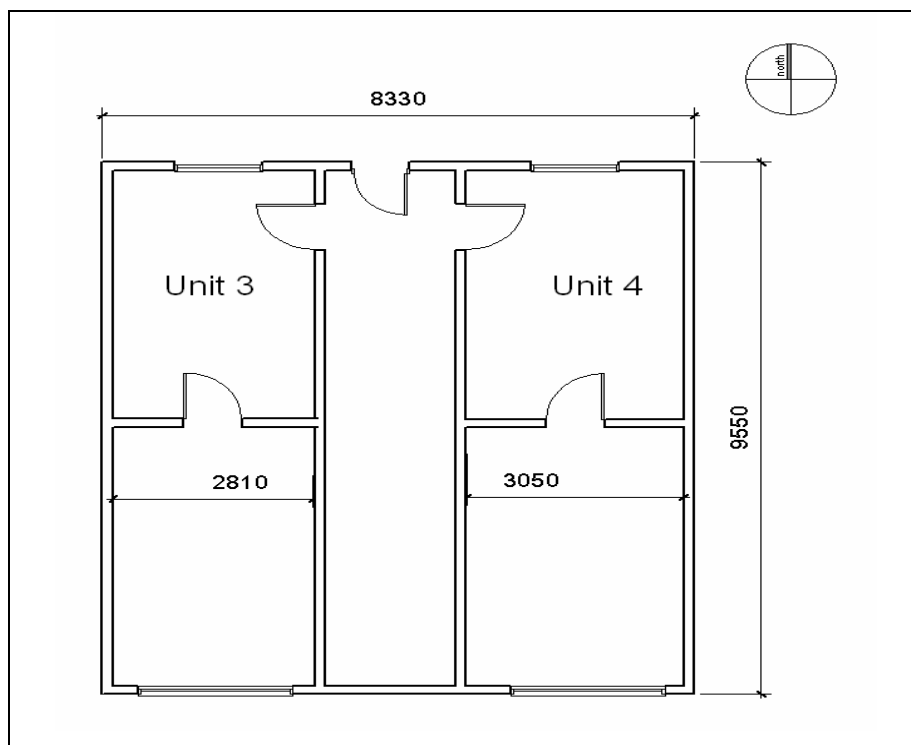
Floor plan of test buildings with two units (Source: Barakat 1986)
